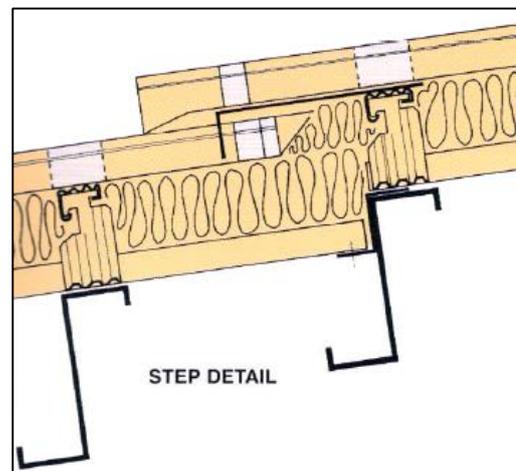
Typical step lap detail (MCRMA, 1999)
